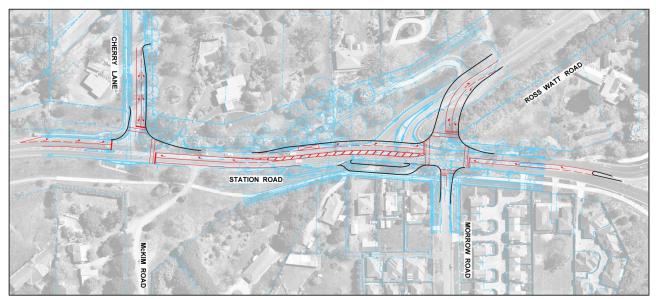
Proposed Interim Roundabout Upgrades – Station Road
